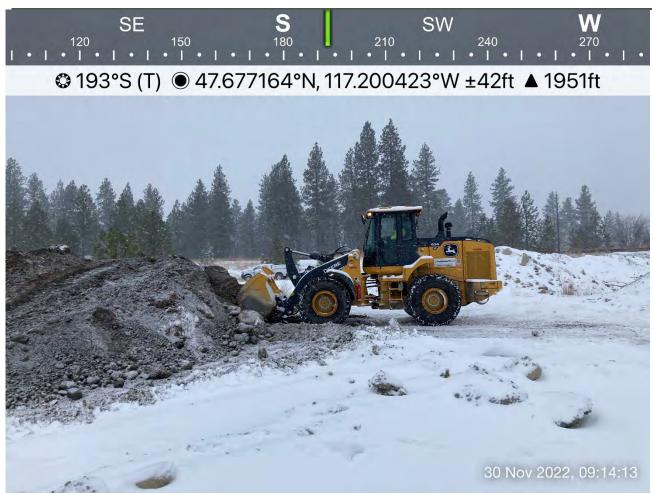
John Deere 624 front-end loader moving excavated material from the pile located west of Excavations 8 & 9 to a location near planned Excavation 4.
